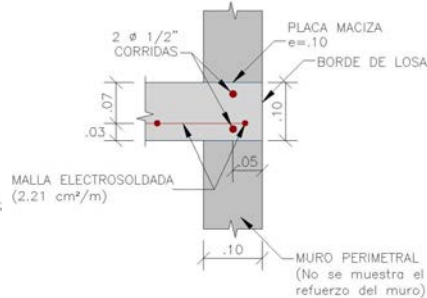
Typical connection between slab and shear wall. Photo courtesy of Alvaro P
